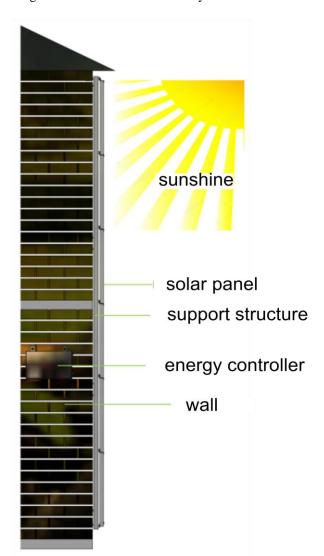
Cross-sectional view of the anchoring system for photovoltaic facades
